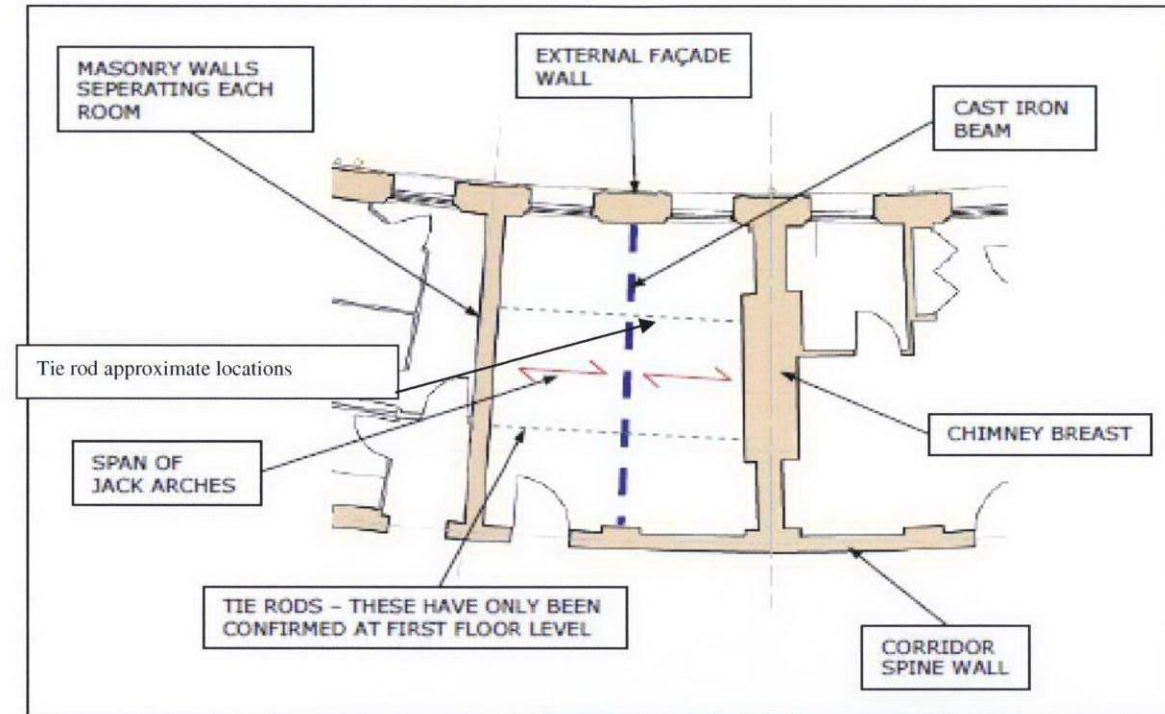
General structural layout of hotel indicating jack arch floor from level 3 to 5.
